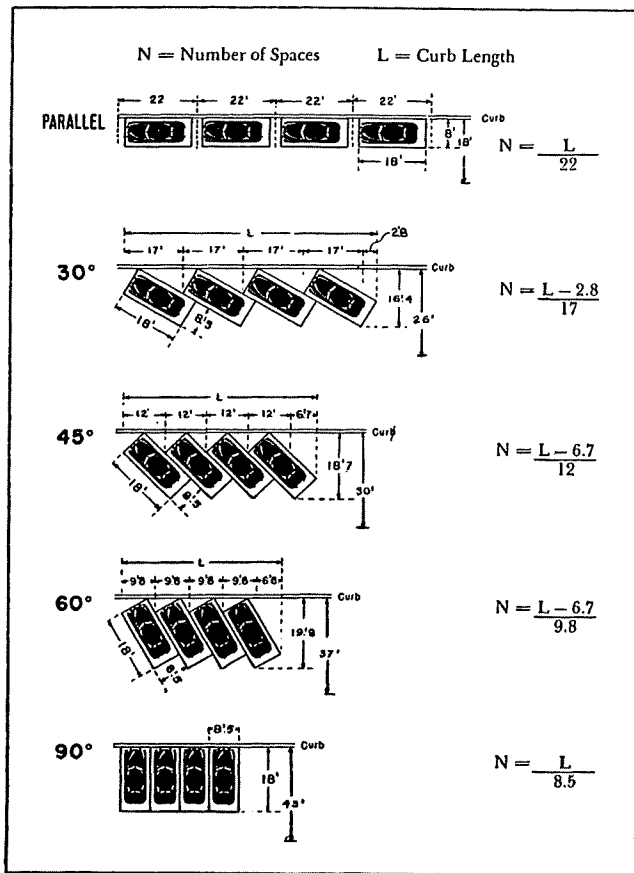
Street space used for various parking positions, using 8'6" x 18'0" stalls
